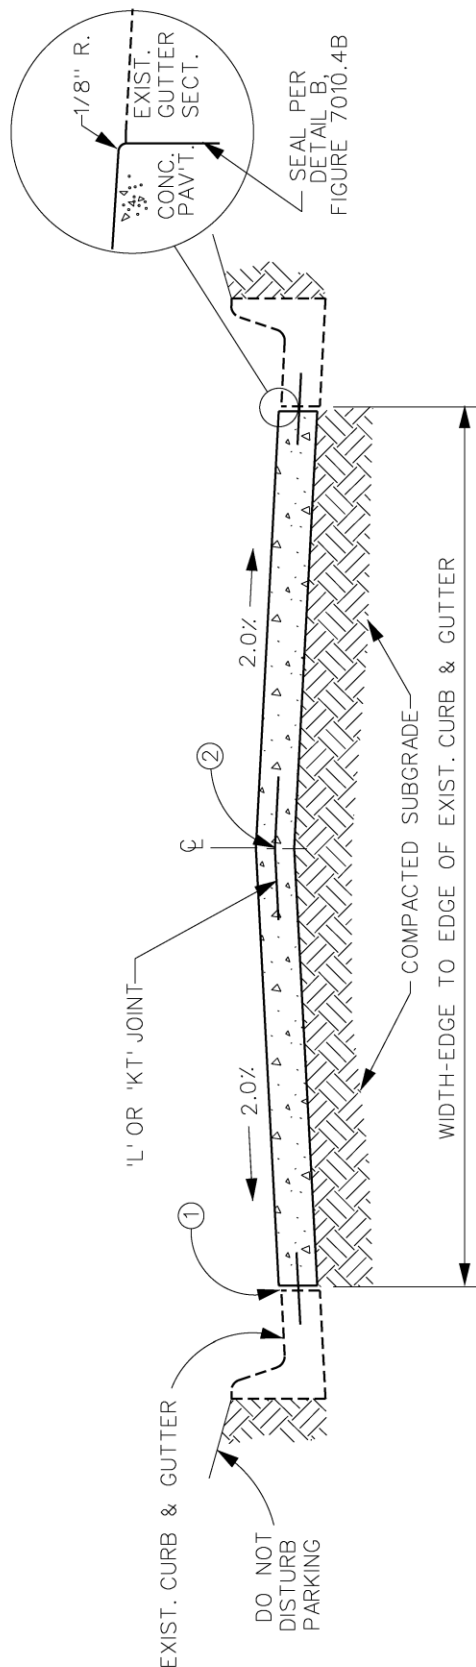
G-2.17: PCC Pavement Section Between Existing Curb and Gutter
